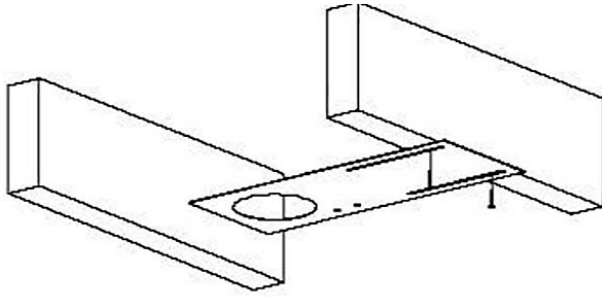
Nail in the mounting plate to the ceiling joist (adjust plate as needed).
